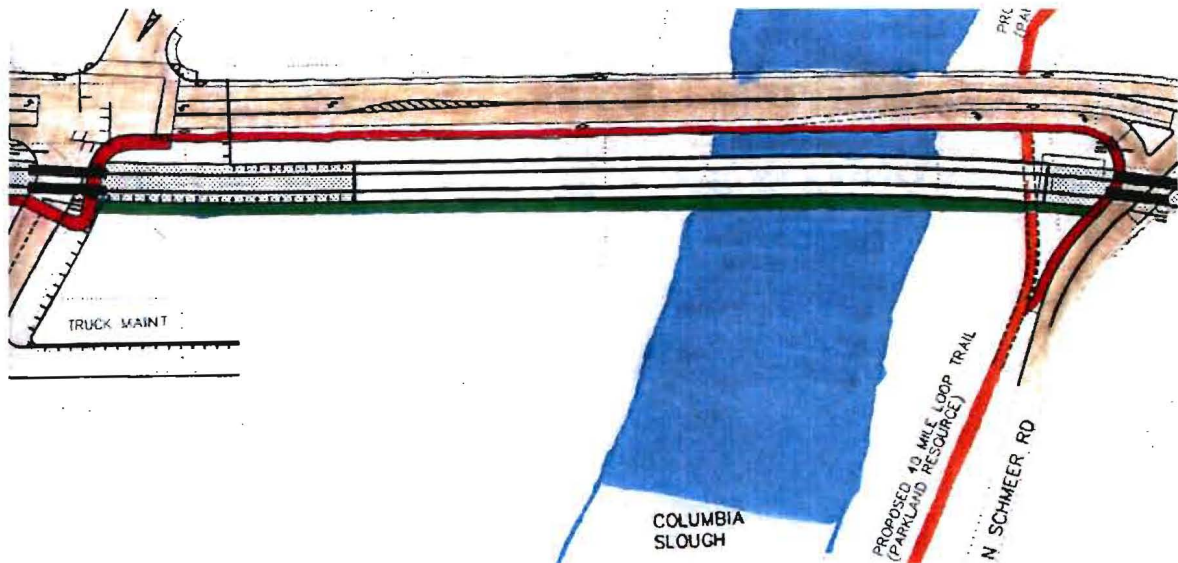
Under current designs, pedestrian facilities (red) will remain on the Denver Avenue bridge, separated from the MAX bridge (green).
